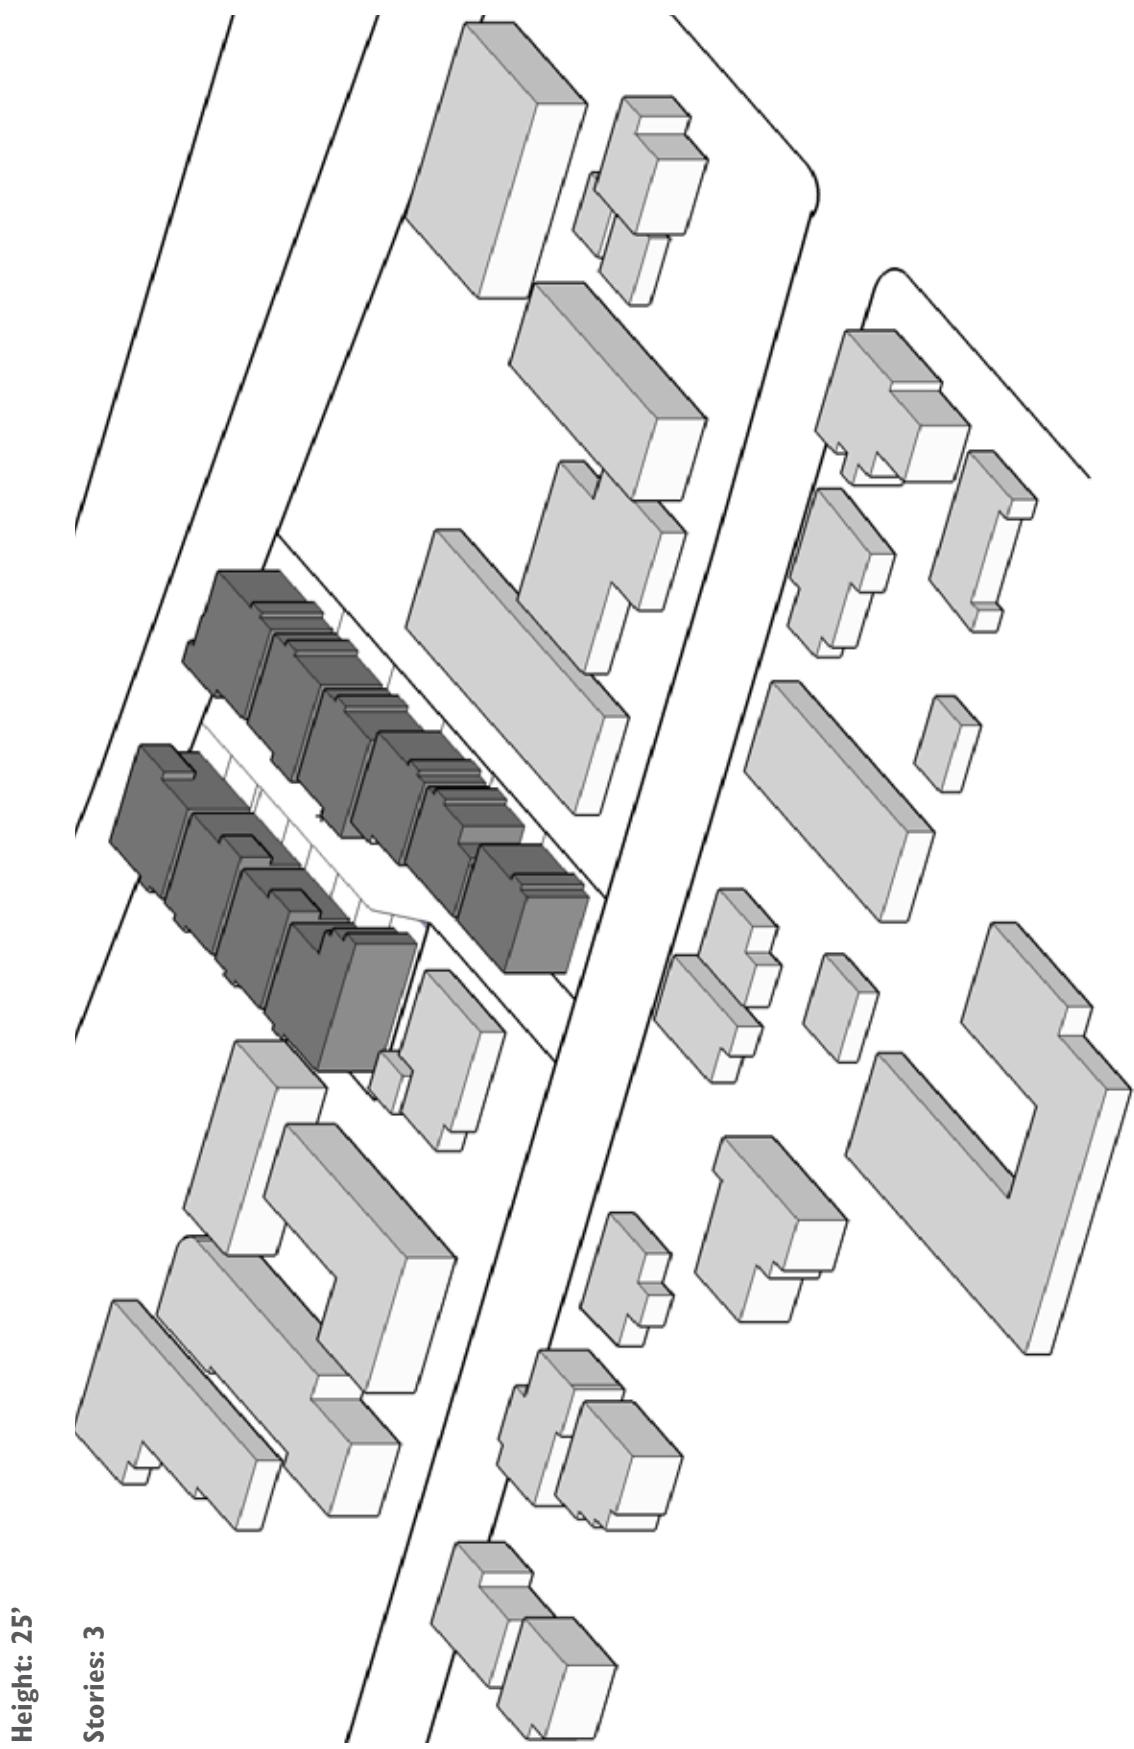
16100 MAUBERT AVENUE AND SURROUNDING CONTEXT
